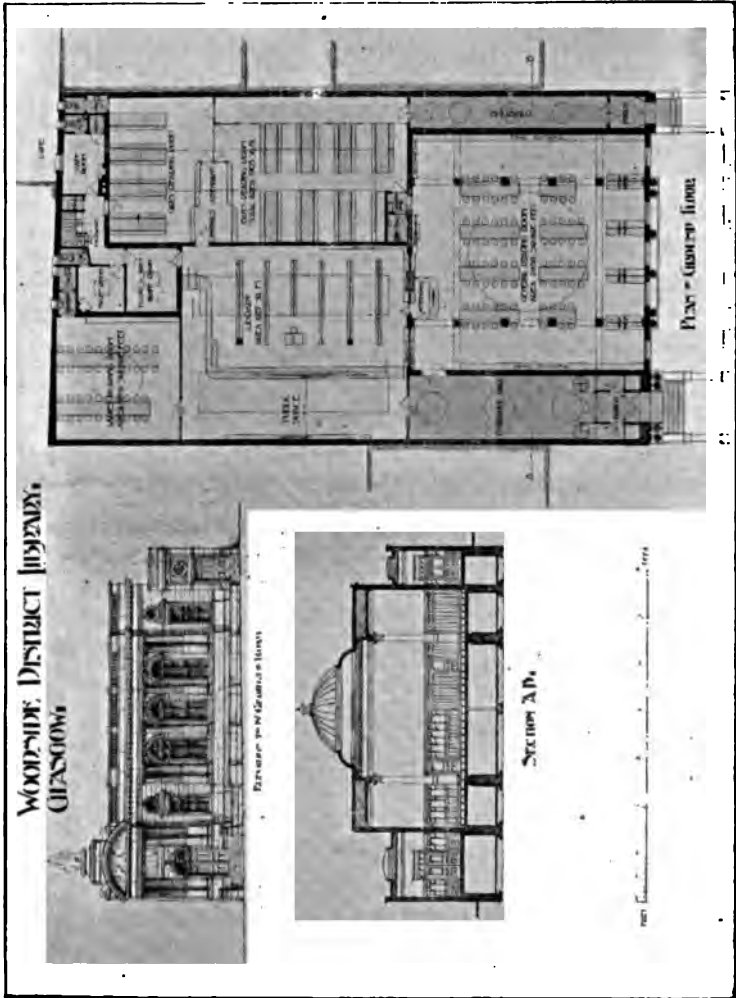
Glasgow Branch Library Plan and Elevation (Section 118).
